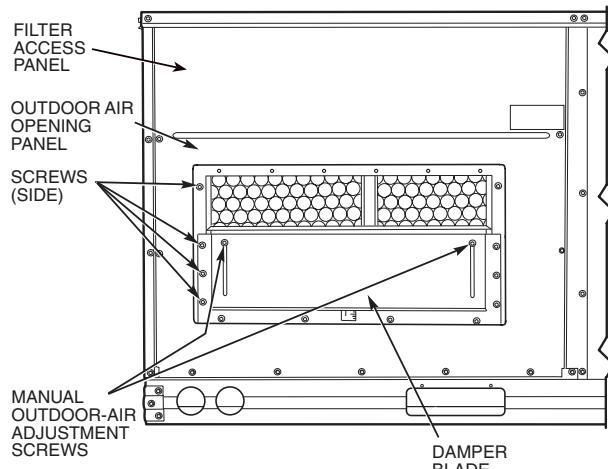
Damper Panel with Manual Outdoor-Air Damper Installed
